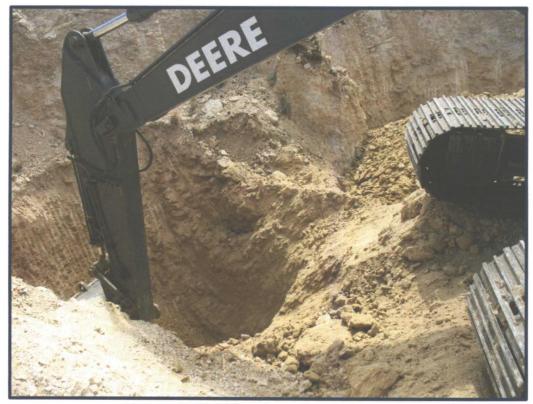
Greyish material excavated from S-1, initially thought to possibly be grout from abandoned well but determined to be stained caliche as field PID readings indicated petroleum contamination.
